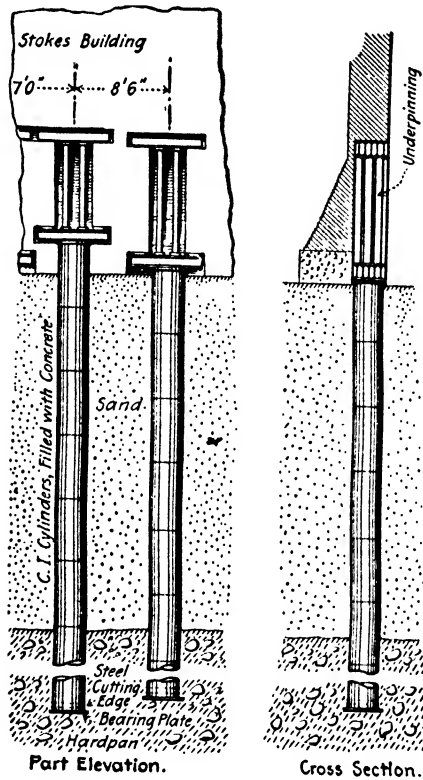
Underpinning the Stokes Building, New York City.
